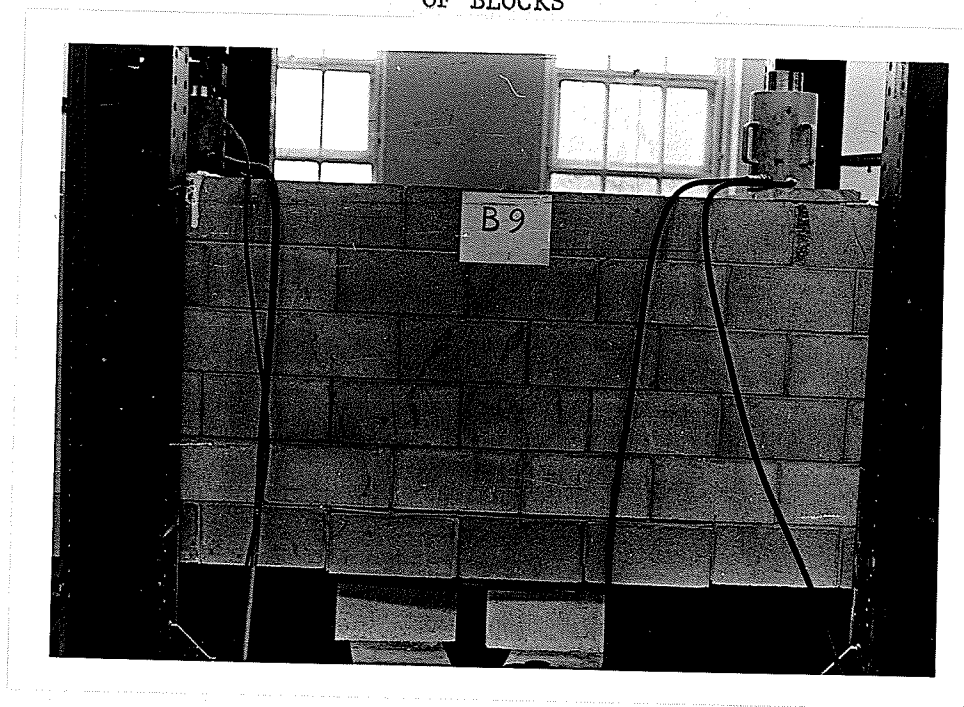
CENTRE OF BEAM 9. TOP BLOCK AND MORTAR JOINT CRUSHED LEADING TO FLEXURAL FAILURE. BOTTOM BLOCKS FELL OUT DUE TO HIGH TENSILE FORCE
